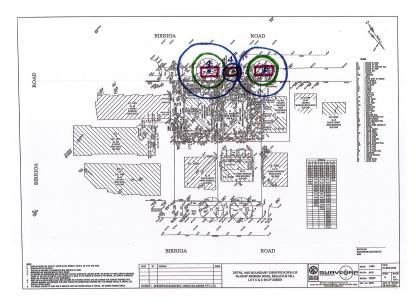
Plan of the site showing retained trees and suggested tree protection fences (red rectangles).
